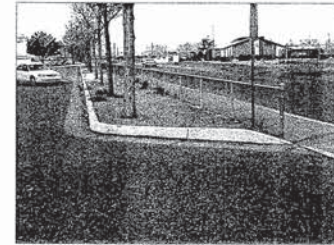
PHOTO 'B' CHURCH NORTH OF PROPOSED ROADWAY FOR
